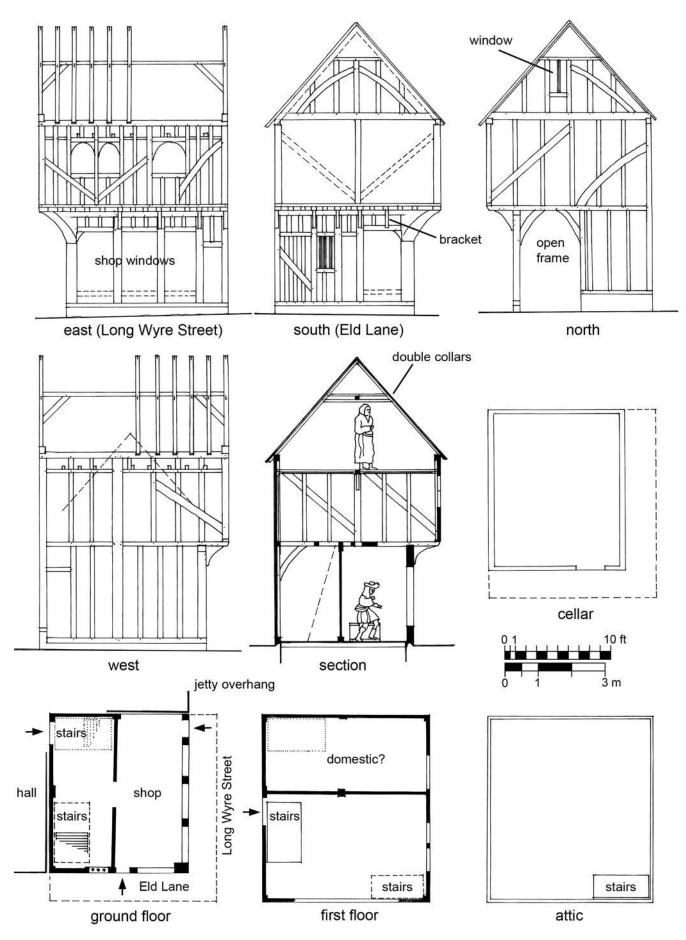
Plans and elevations of 37 Long Wyre Street (corpus no. 55)
